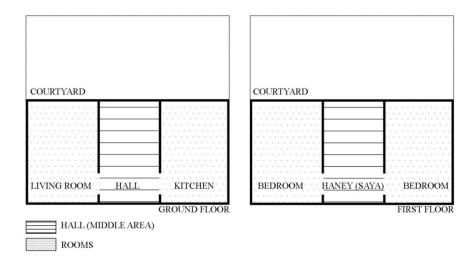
Plan layout of the house with central entrance without bay window (S.Sevimbige archive, 2018)
